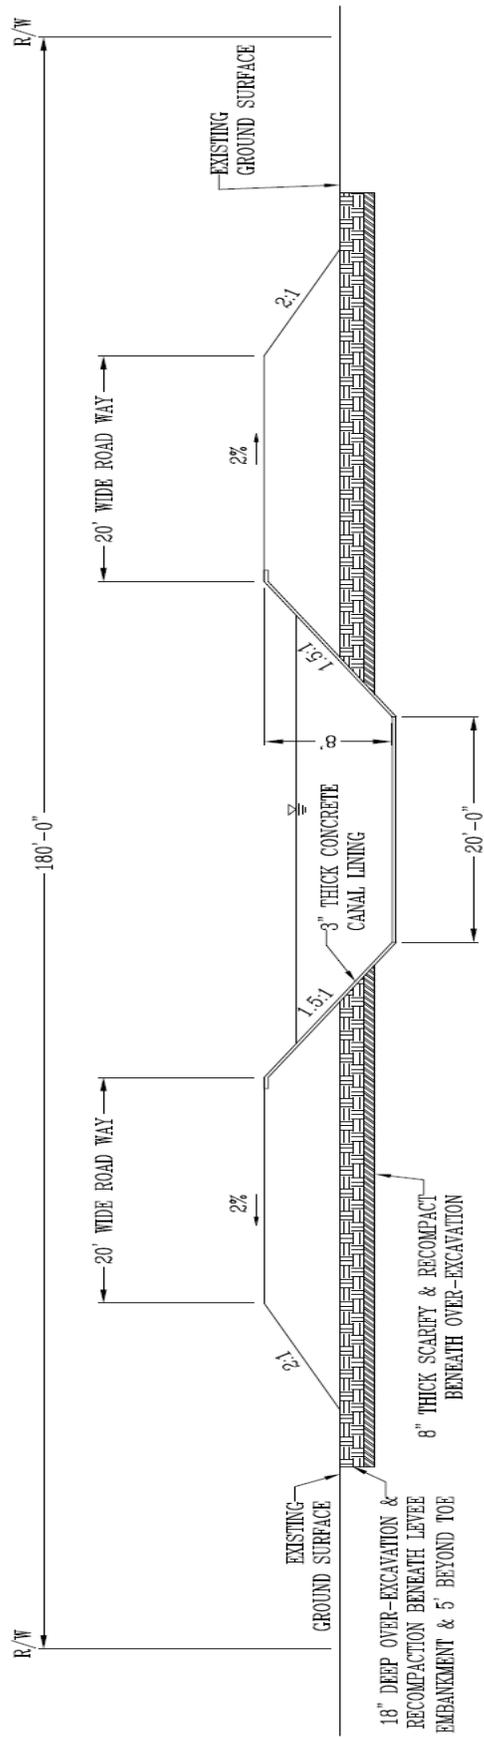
Preliminary Canal Cross-Section with 1.5:1 Side Slopes
